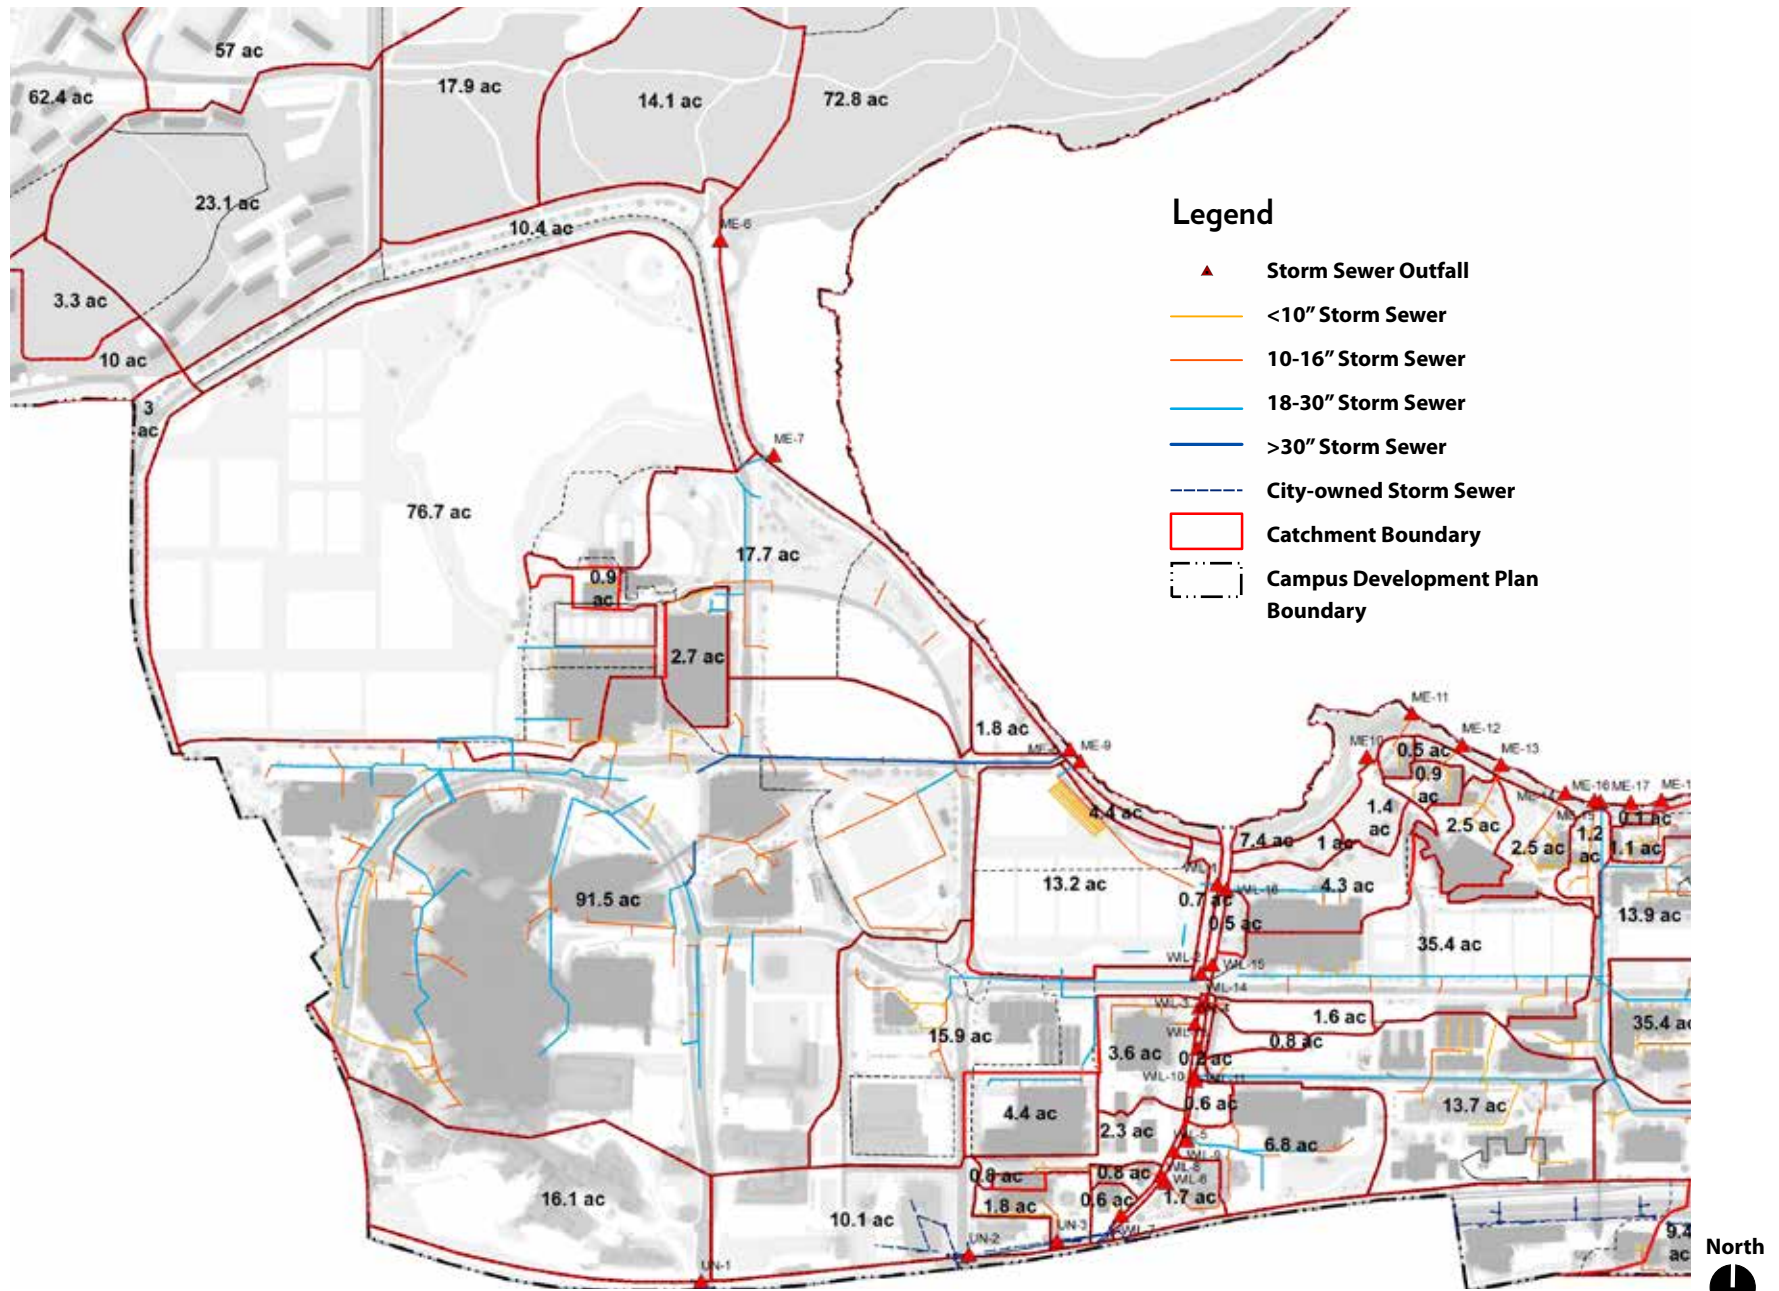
Existing Storm Sewer System and Outfalls – West Campus
